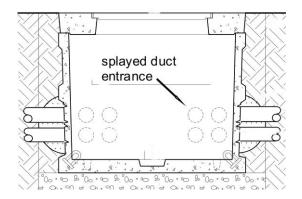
Splayed manhole showing duct entrance located near sidewall.
